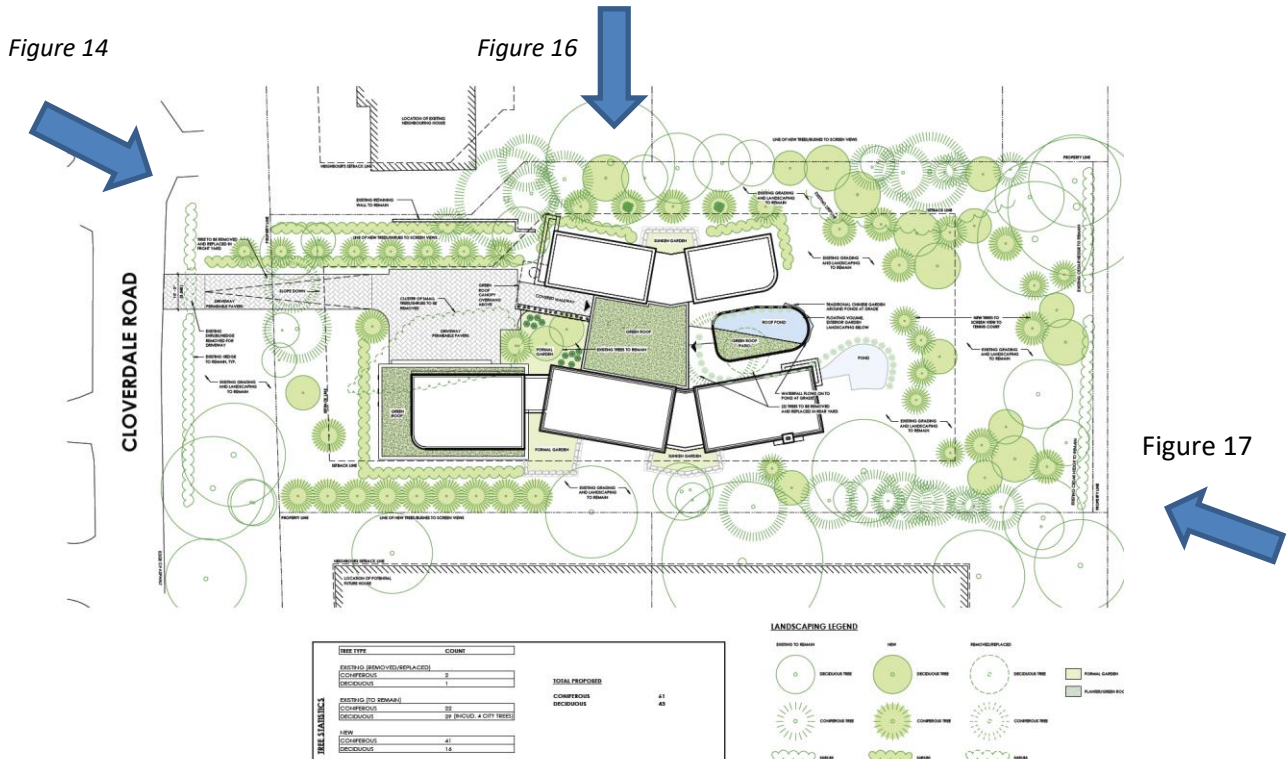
Conceptual landscape plan showing the layout. The new house is setback from the street and is well back from the next-door house to the north. Source: Linebox Studio 2023.
